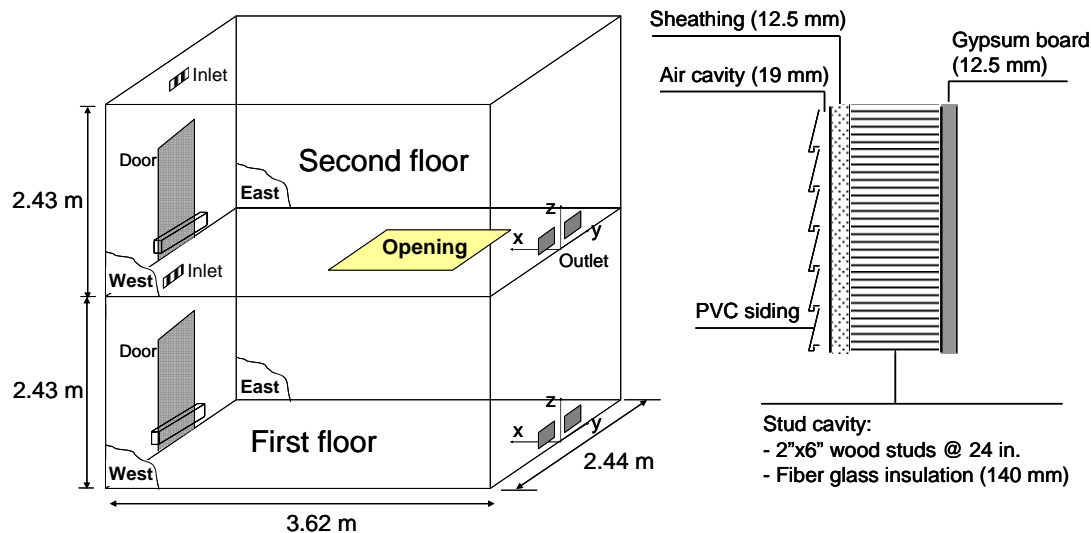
Schematic drawings of two-story test-hut and wall cross section.
